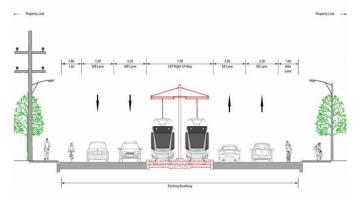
Proposed Road Section of 18 and 21-Meter-wide
